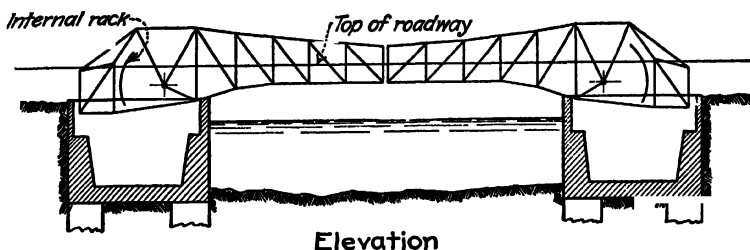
General design of Jefferson Avenue and Fort St. Bridge, Detroit; also the new railroad bridge for the Detroit, Toledo & Ironton R. R. over the Short Cut Canal at Detroit; also all the late bridges in Chicago.
